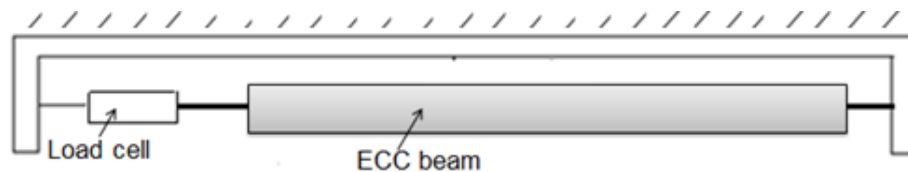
Schematic of connecting the ECC beam on the frame.
